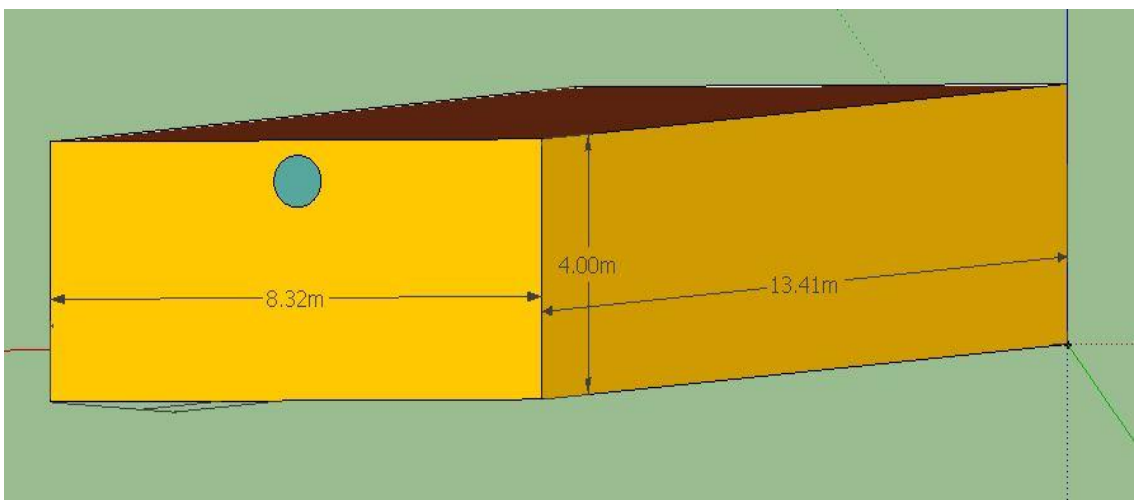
Tnsys 3-D model of Cold Storage building back view
